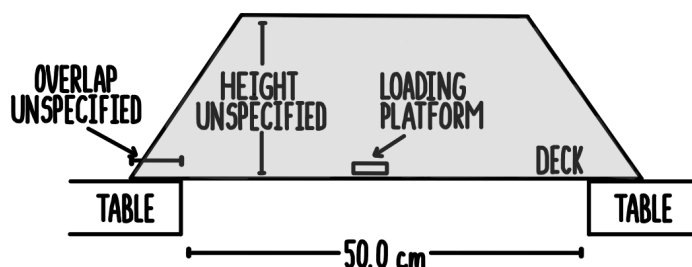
Sideview of the bridge setup. The bridge will be positioned between two tables placed 50 cm apart. The overlap onto the table is unspecified but it is recommended that the bridge be no less than 55.88 cm (22 inches).
